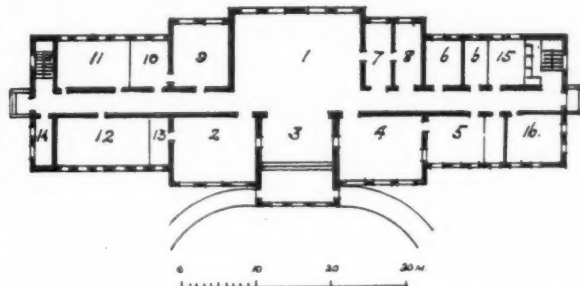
GROUND FLOOR PLAN OF THE KITCHEN BLOCK, THE VIRCHOW HOSPITAL, BERLIN.
